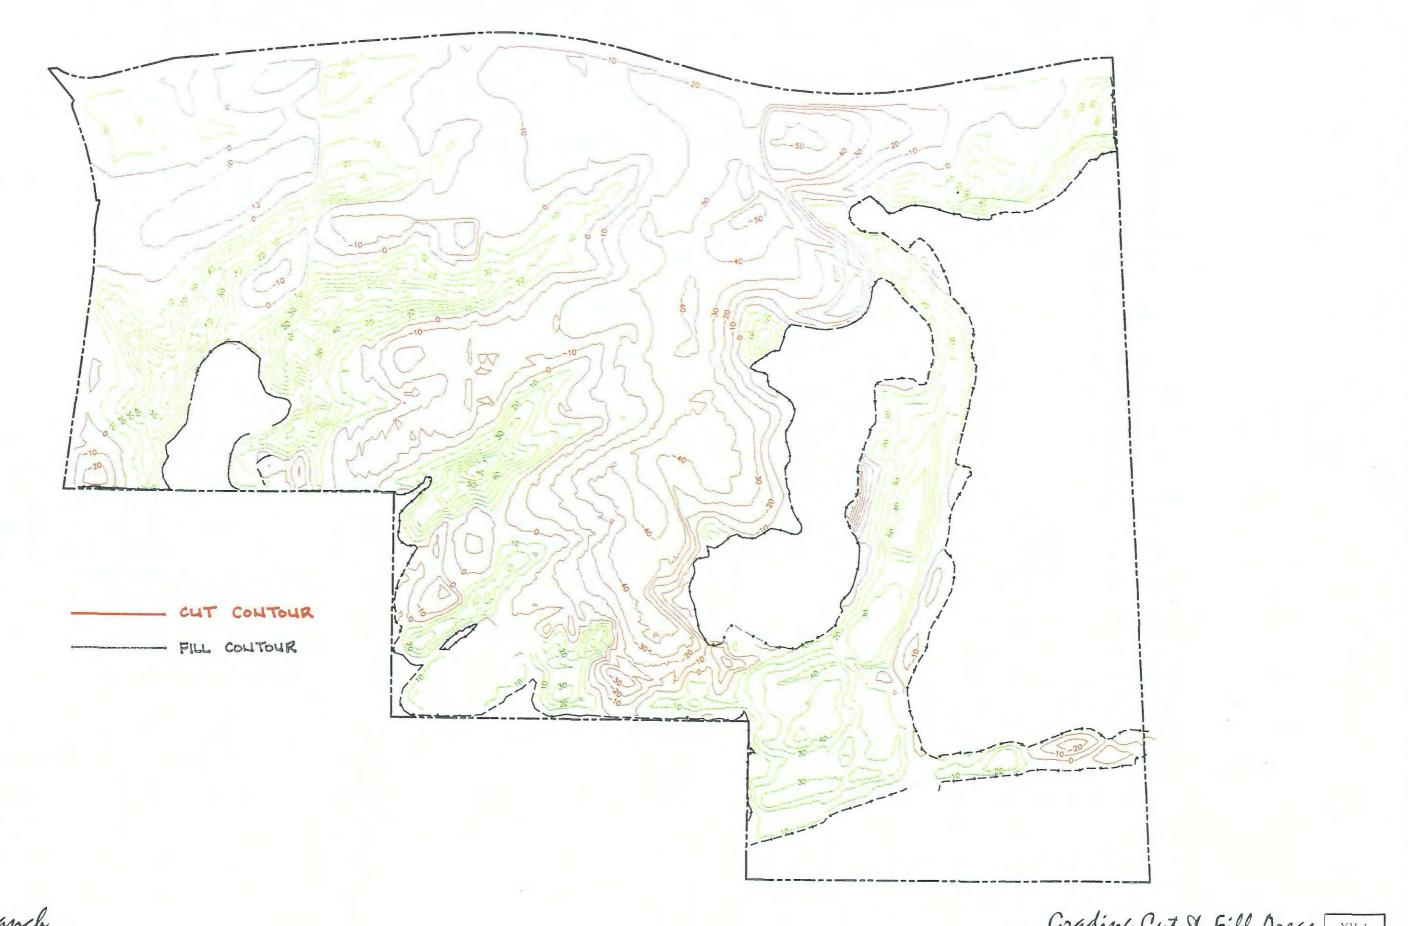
on page XII-3 shows the approximate cut and fill required for development of the Bressi Ranch Master Plan.
